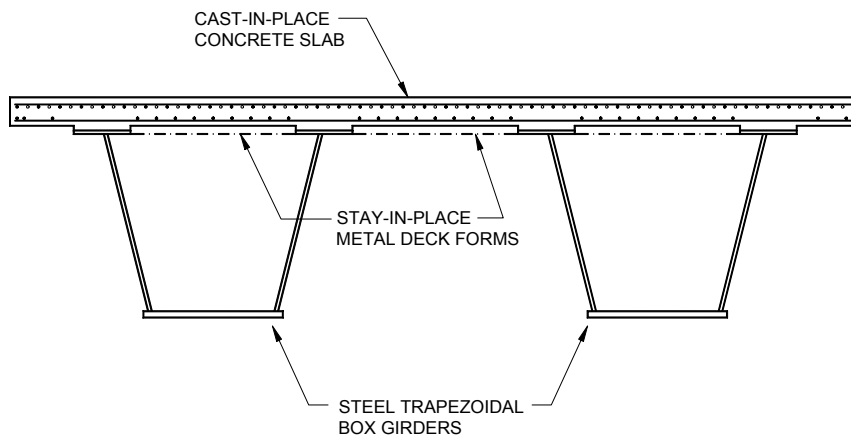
Cross-section of Trapezoidal Box Girder System
